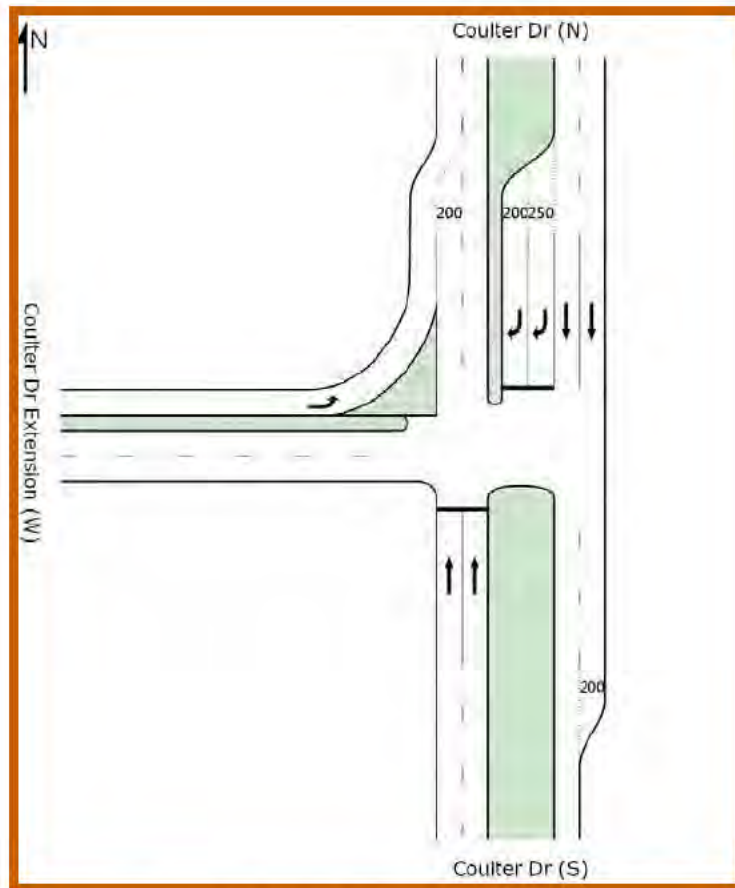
Intersection Layout of Coulter Drive – Coulter Drive Extension (Quadrant 2031)
